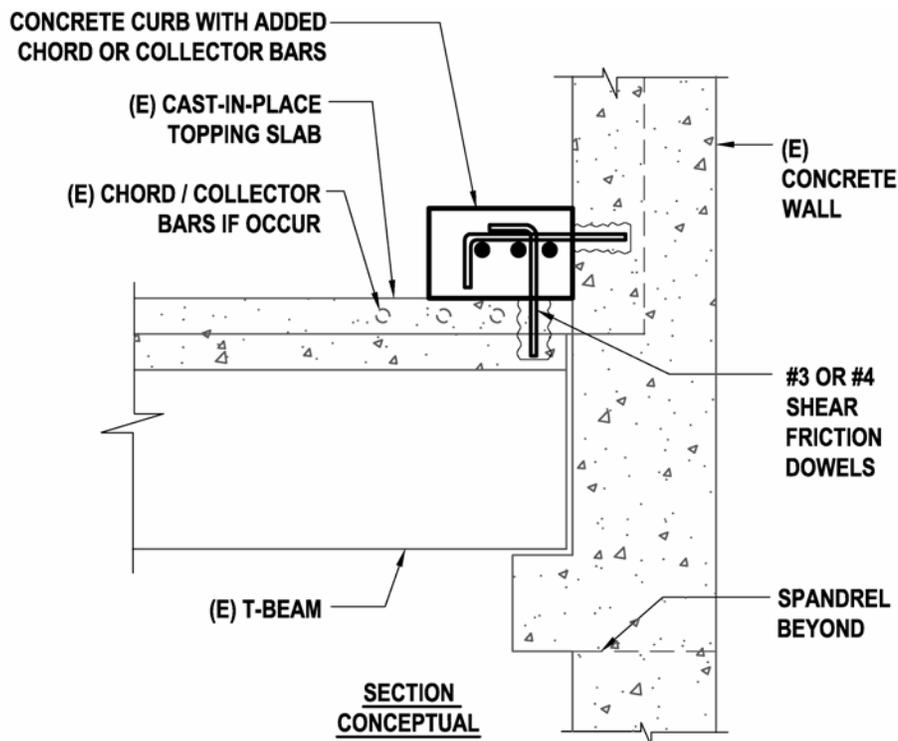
Added Collector Anchorage to Shear Wall with Cast-In-Place Topping Slab
